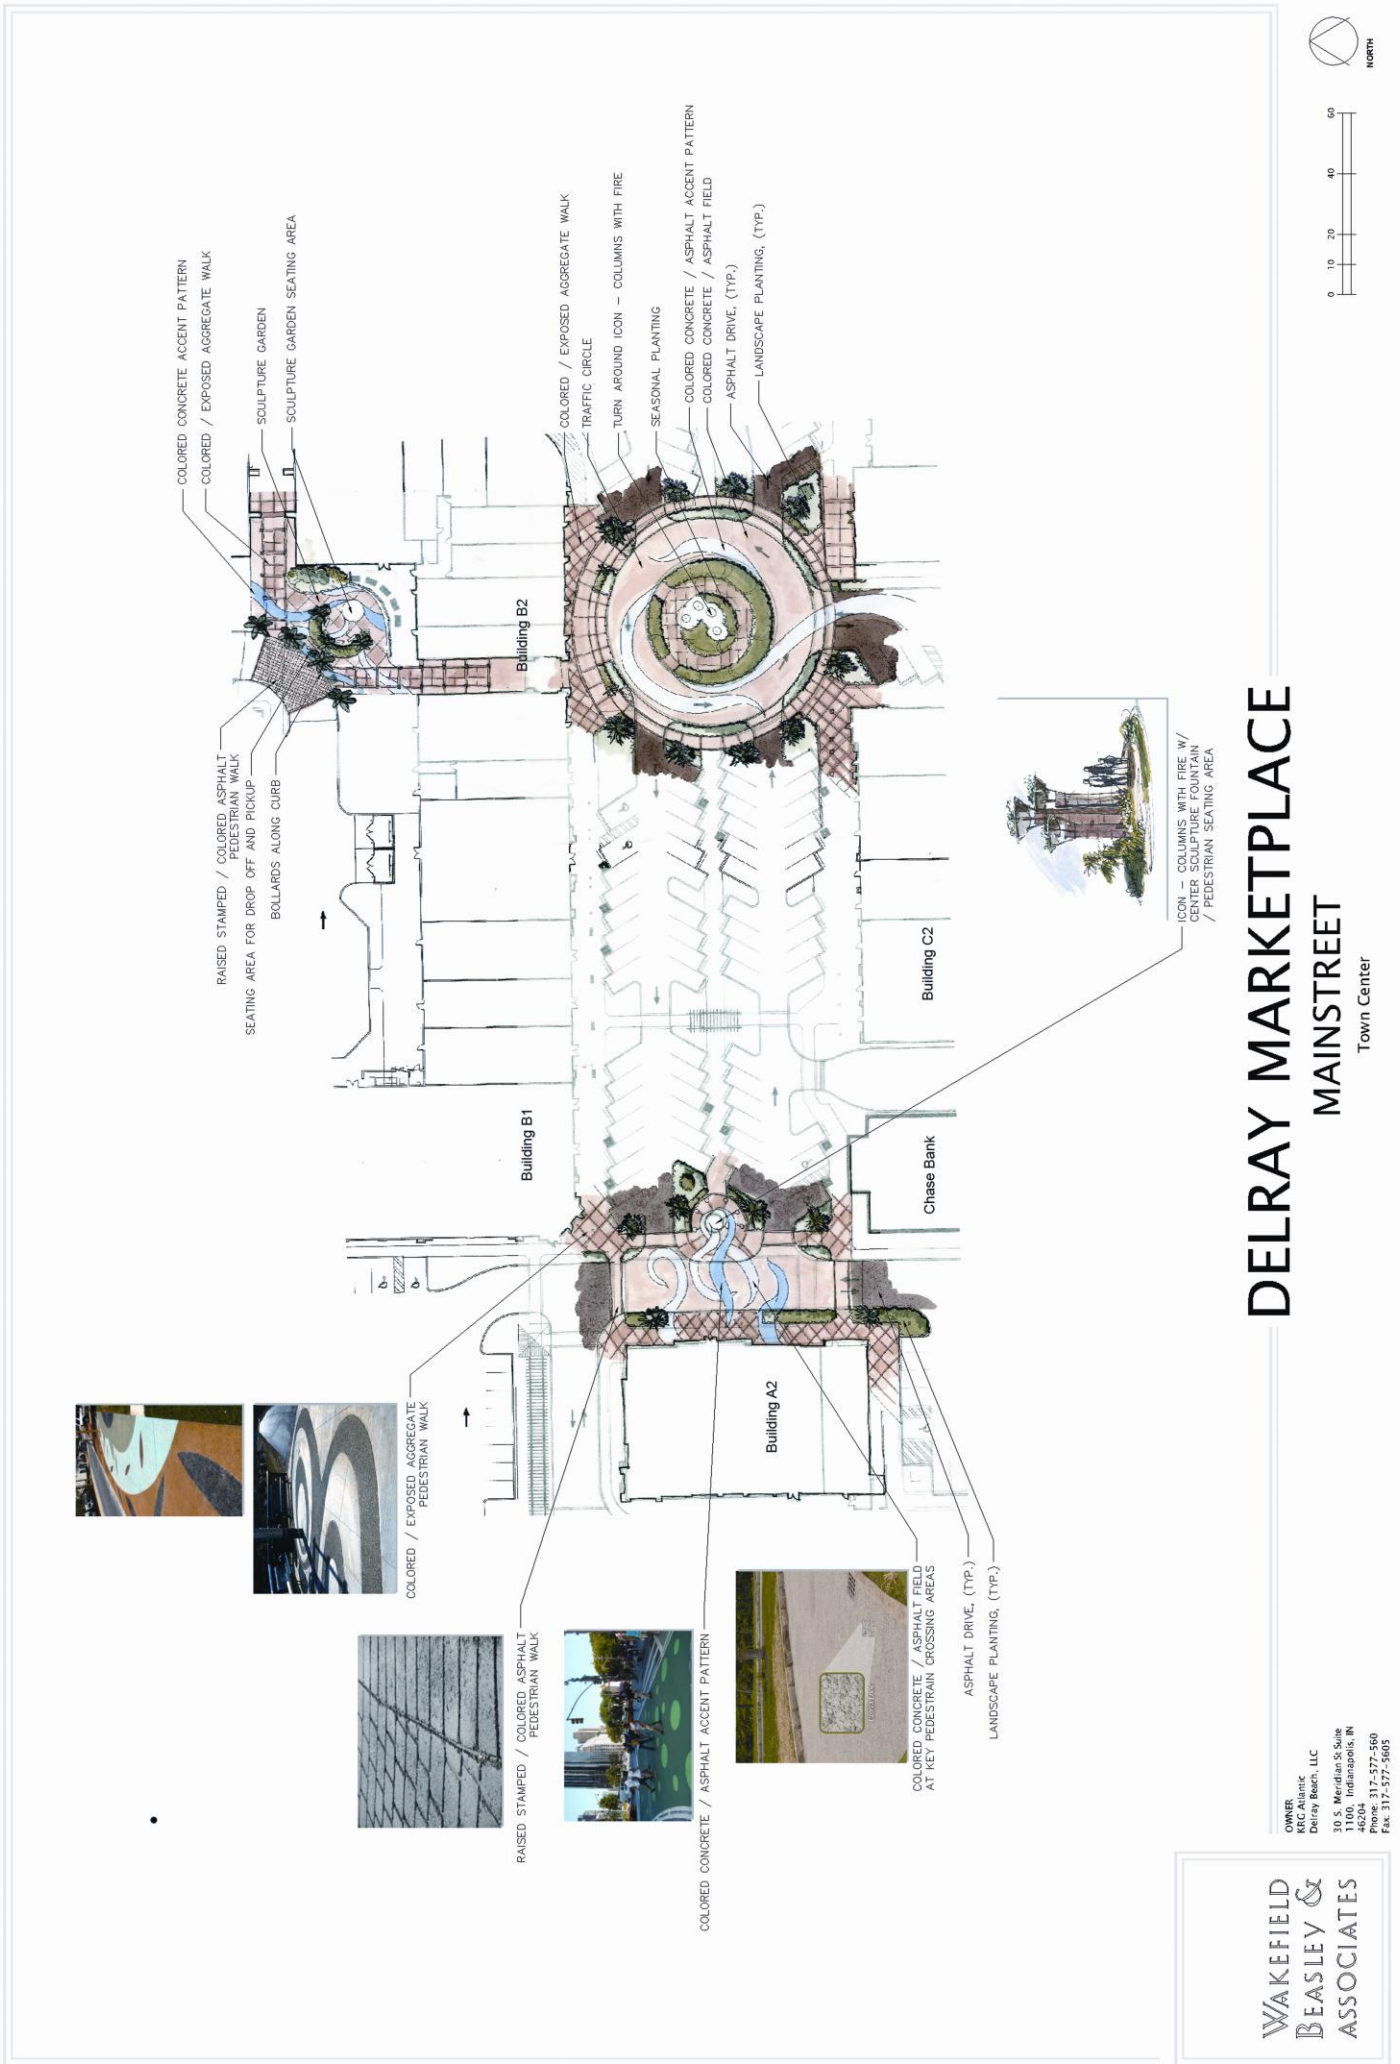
Building A2 Focal Point and Main Street Conceptual submitted on June 20, 2011
